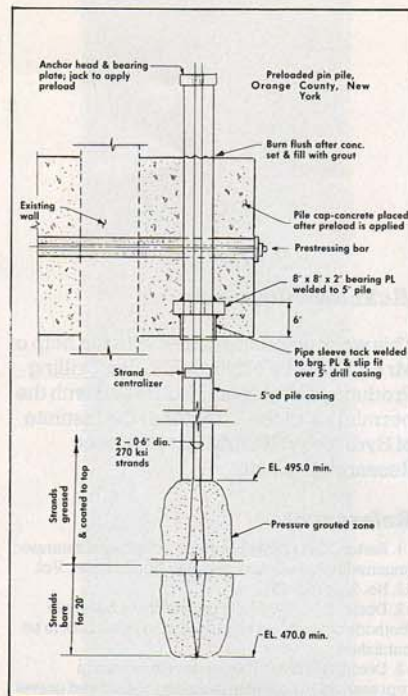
Detail of preloaded minipile, Mid Orange Correctional Facility.
